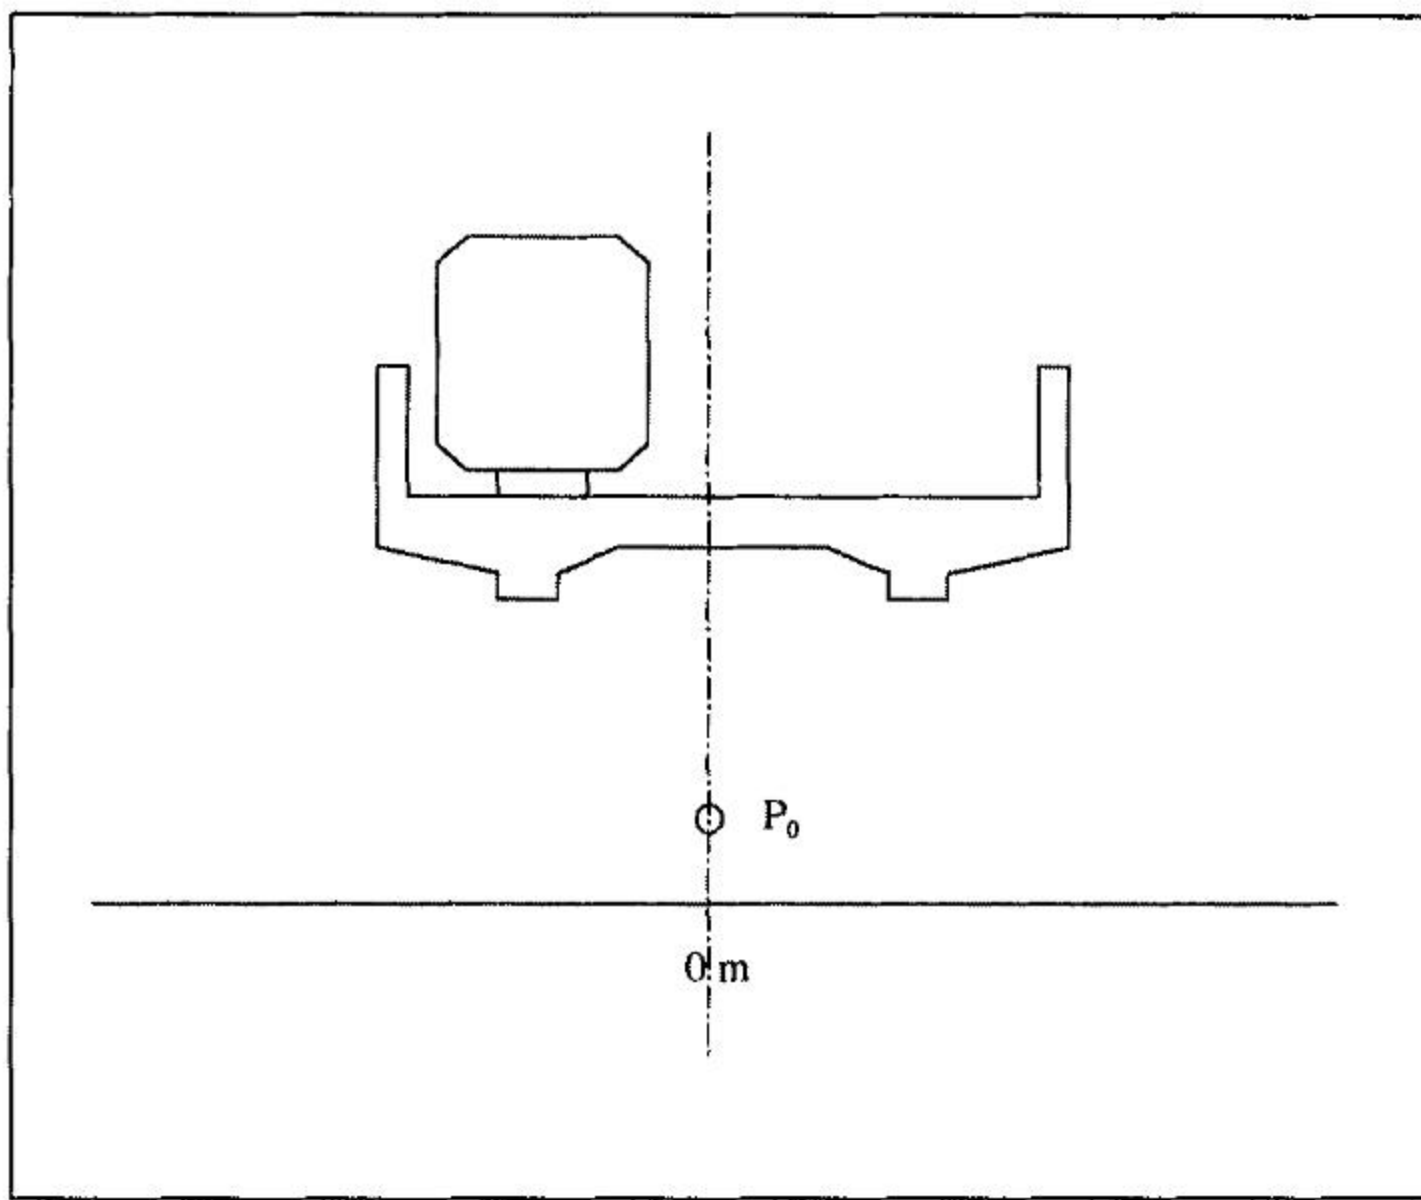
Concrete Structure Sketch and Measurement Locations of High Speed Shinkansen System in Japan (Not In Scale)
